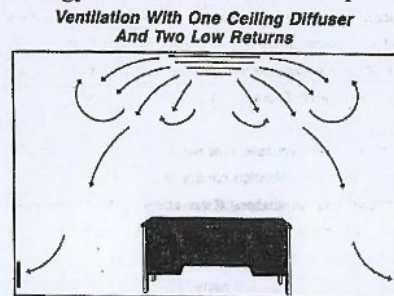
Air entering a room from the ceiling and leaving at floor level to create a downdraft.
